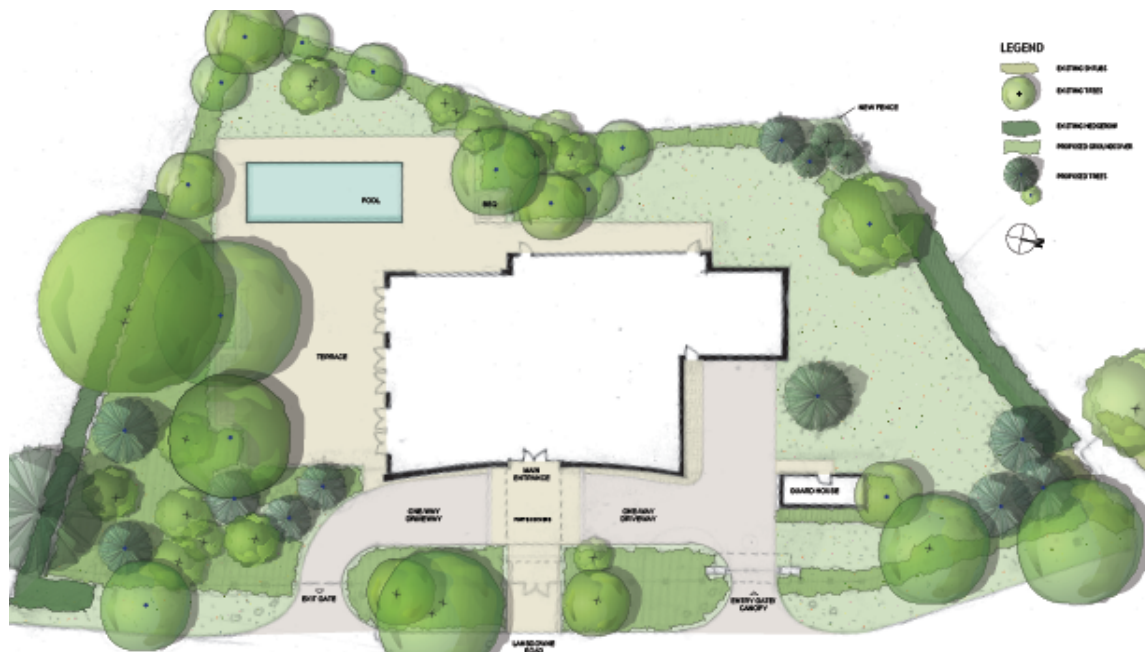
Conceptual landscape plan for 187 Lansdowne Road. (Douglas Associates Landscape Architects, Julian Jacobs Architects, 10 January 2012.)
